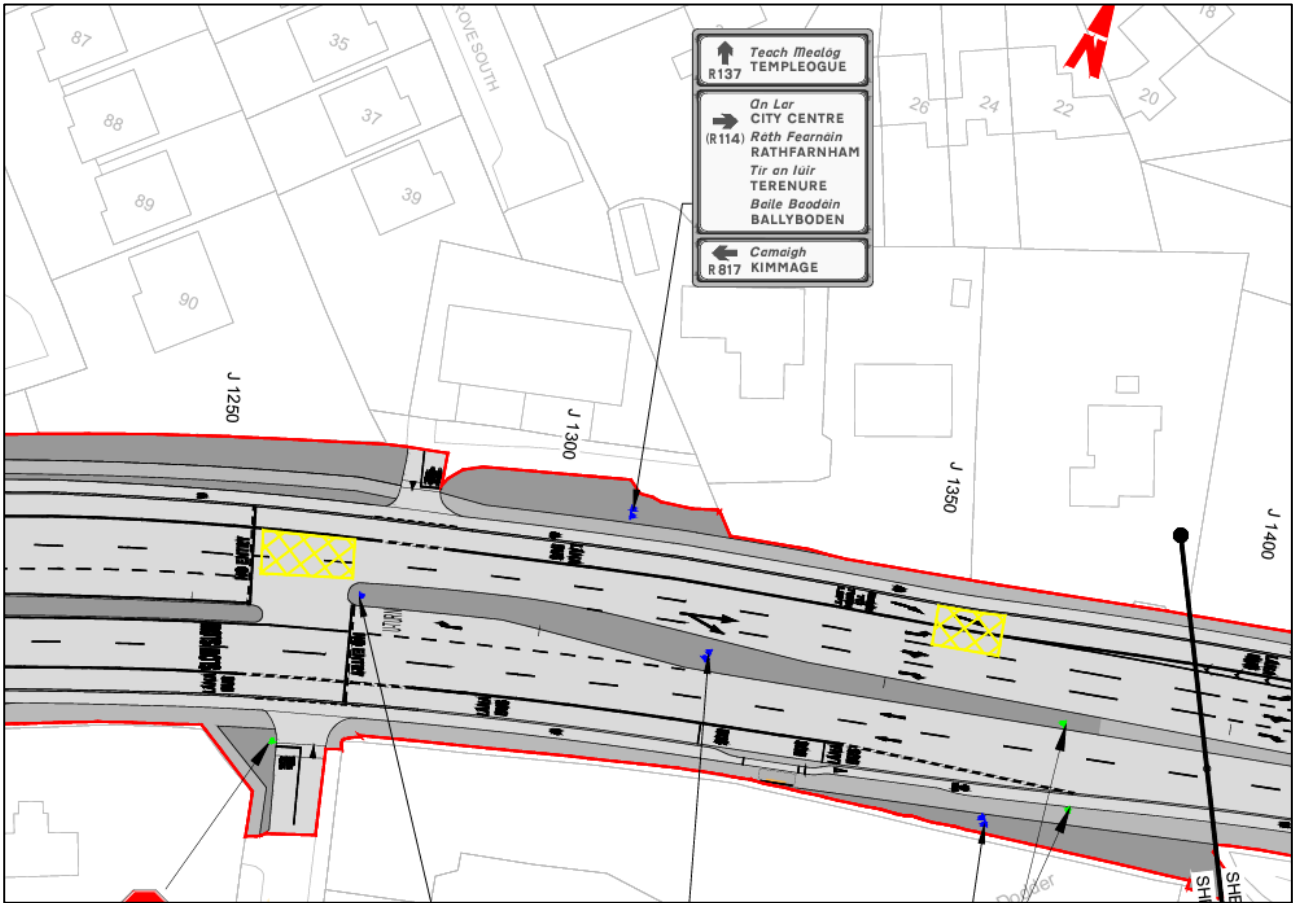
Extract from Traffic Signs and Road Markings Drawings (Sheet 31)
